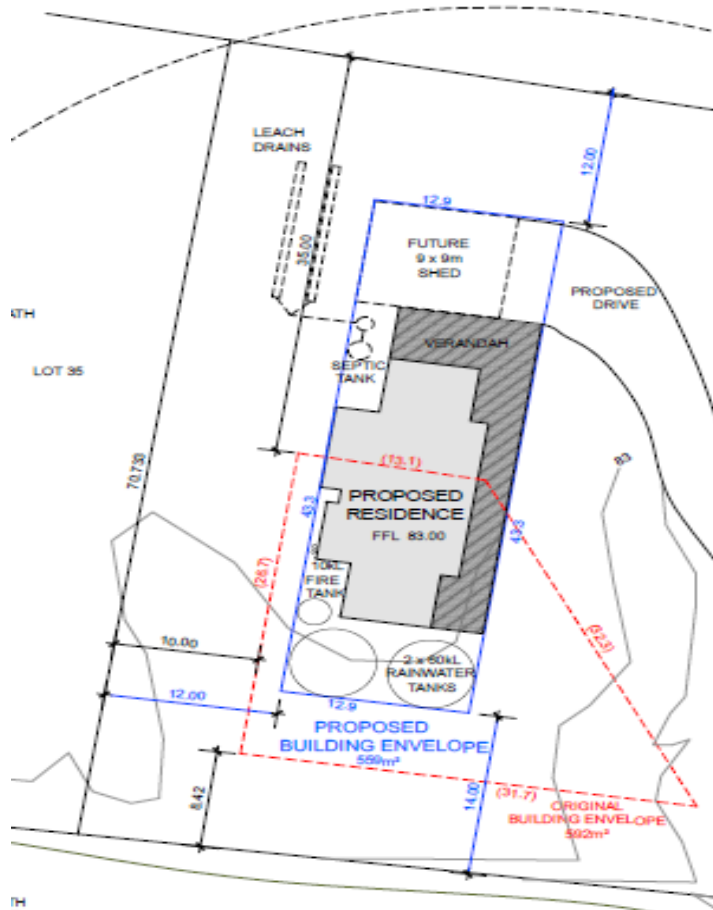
Site Plan Extract (Existing & Proposed Envelopes)
